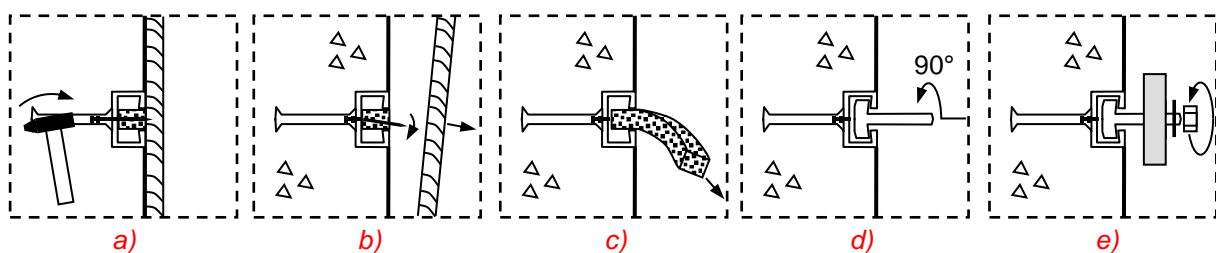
Anchor channel installation sequence: a) Nailing of the anchor channel, placing of the concrete, b) stripping of the formwork; c) removing of the filler material; d) inserting of the T-bolt; e) fastening of the construction element, e.g. base plates of any component to be connected.
